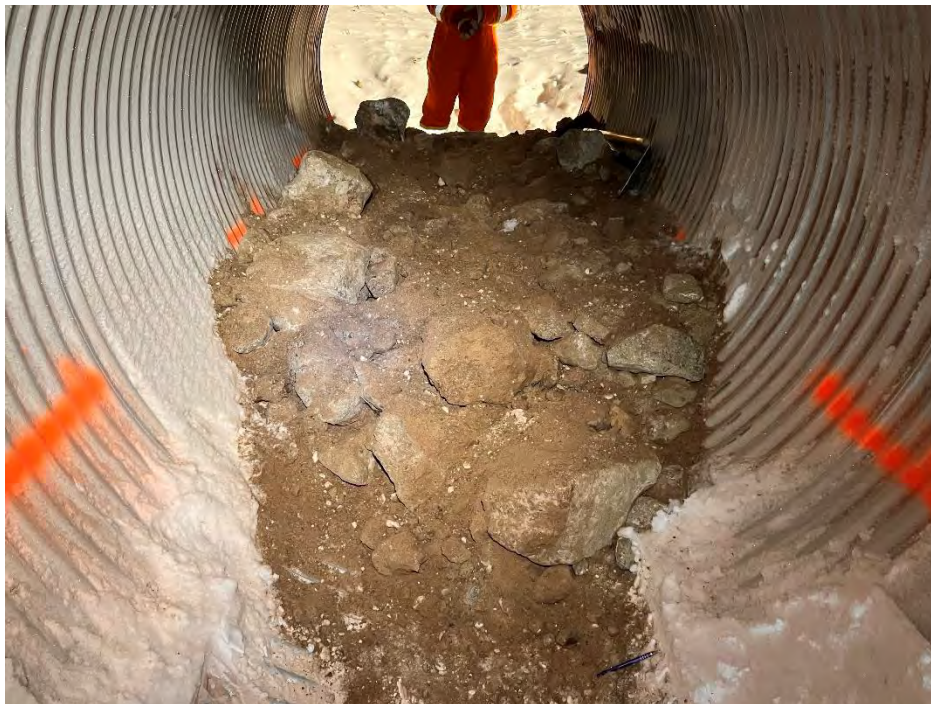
South end (outlet) of CV-001 culvert infilling to 0.72 m above the base of the low flow culvert. Photo taken March 31, 2024, facing outlet.
